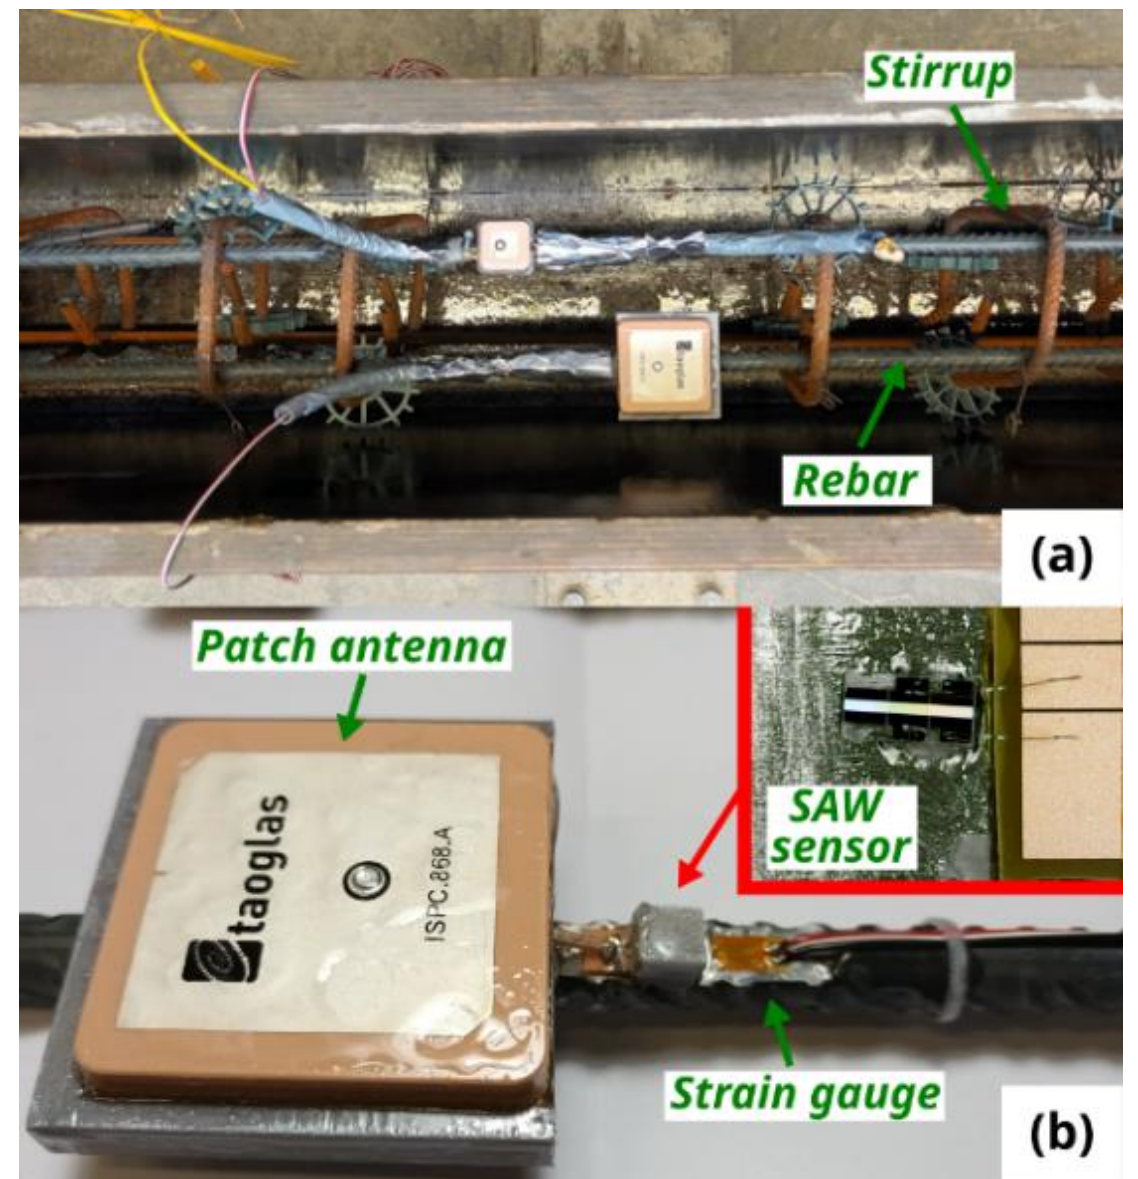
(a) Instrumented beam before concrete casting (upside down view).
